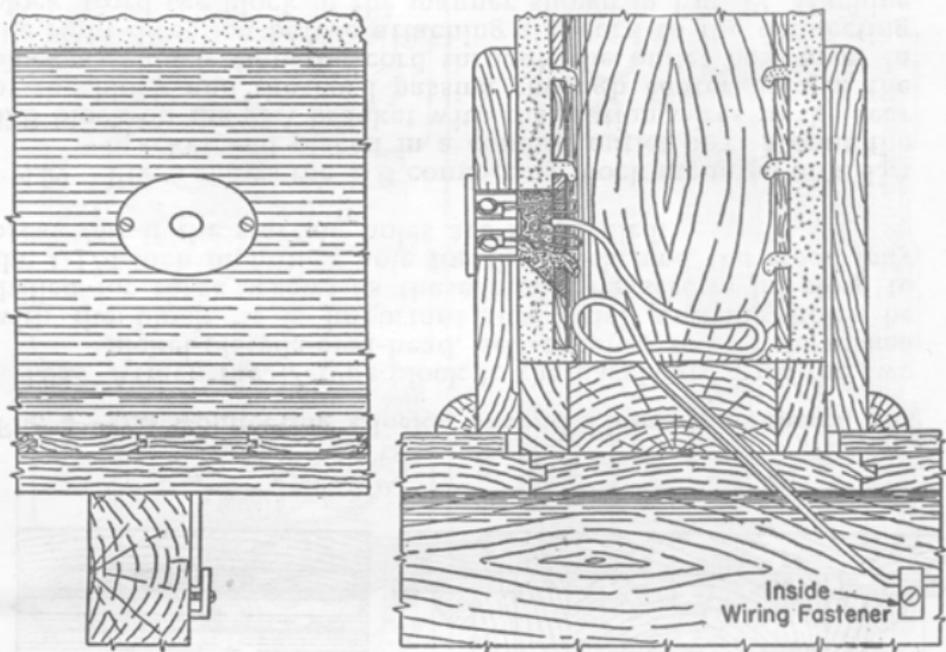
47B Connecting Block on First Floor or Similar Locations
